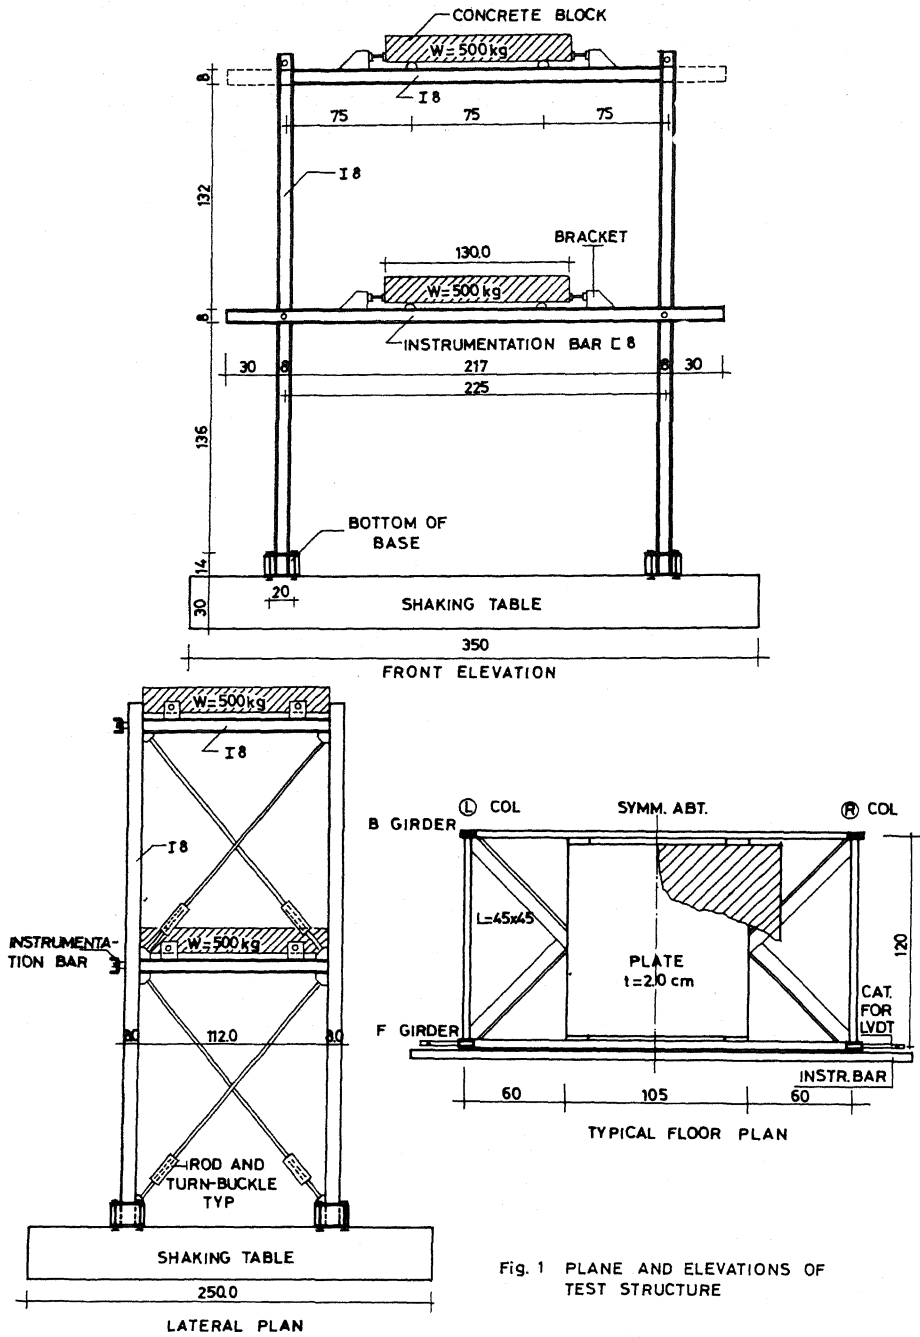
PLANE AND ELEVATIONS OF TEST STRUCTURE
